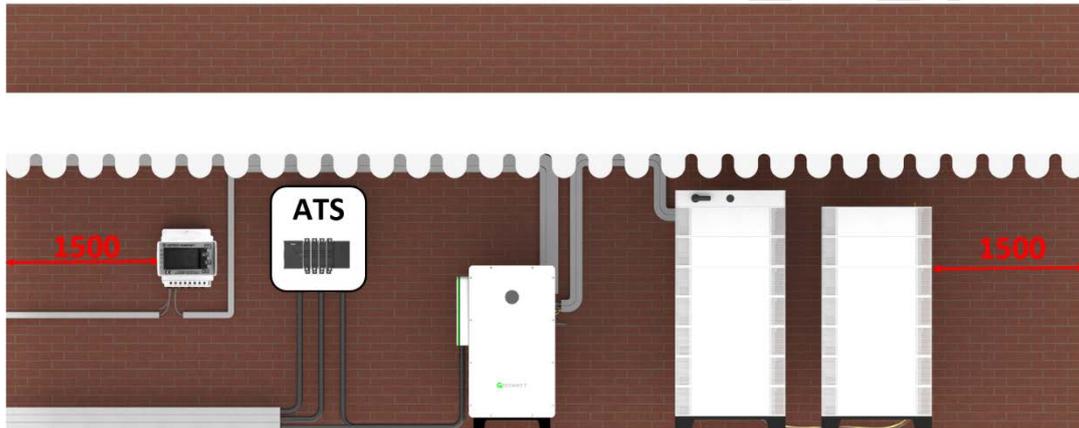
Front view of the sun shelter (The units in the figure are:mm)
